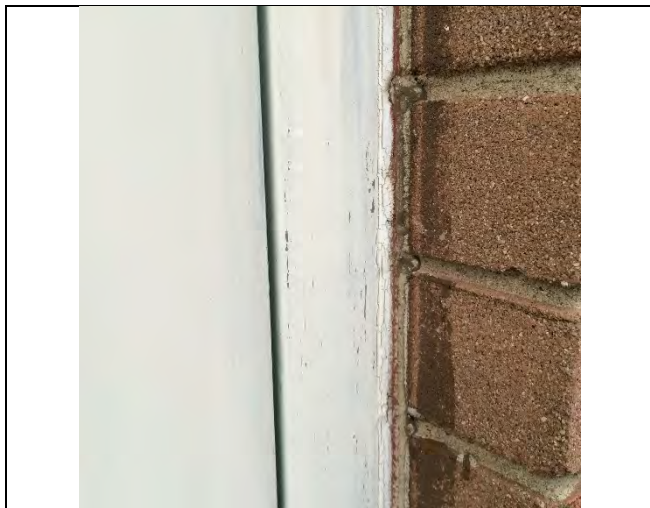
Exterior door caulking – white is identified to be asbestos-containing (6.9% Chrysotile).
